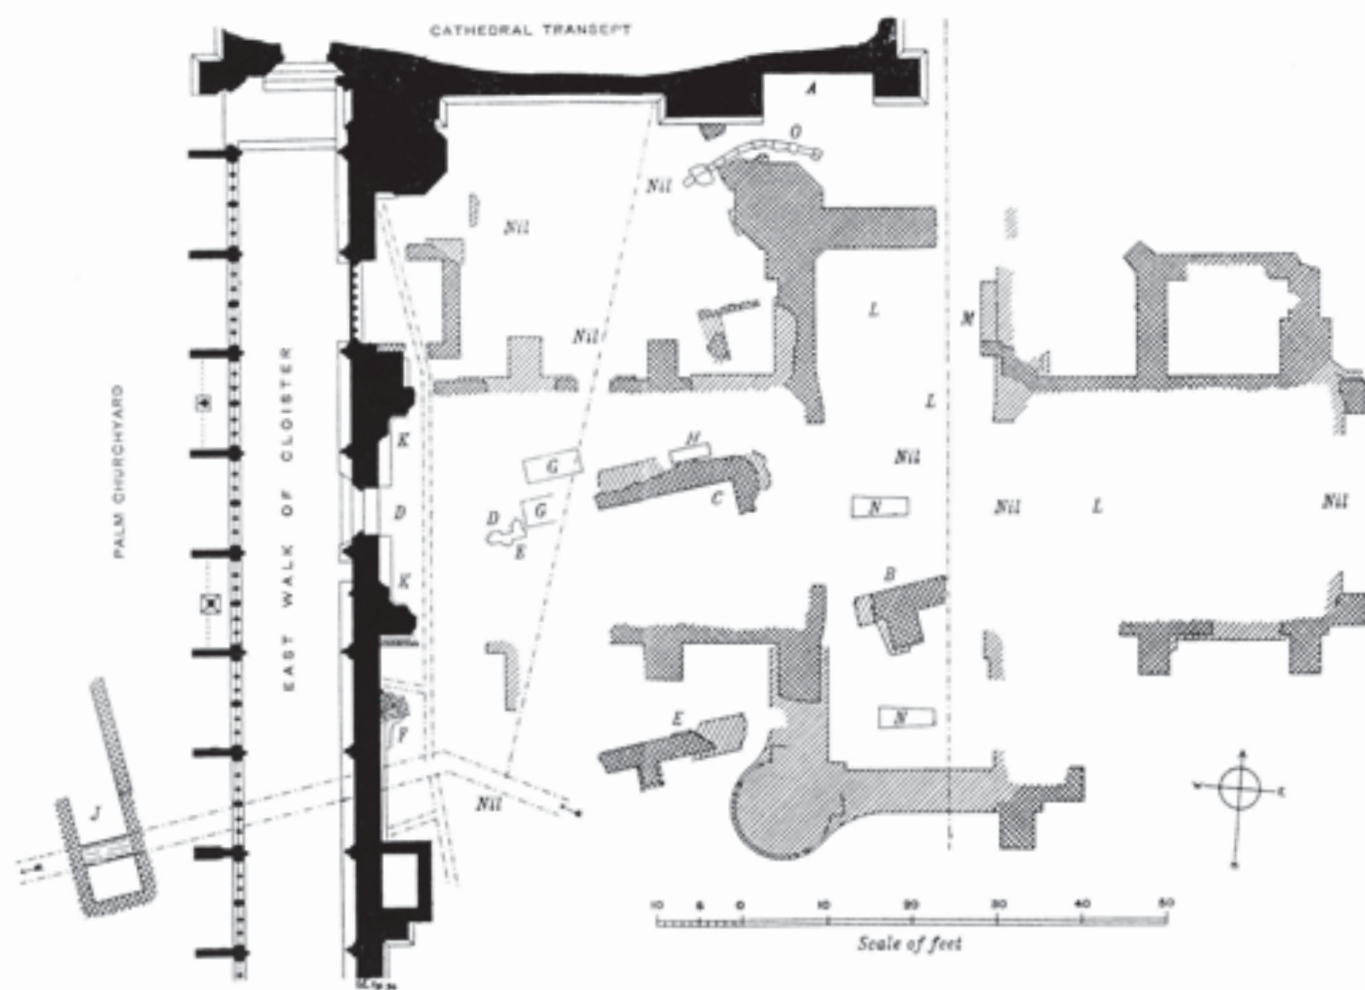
General plan of the foundations and other features uncovered during excavations in the Camery in 1894. After Buckle 1894
